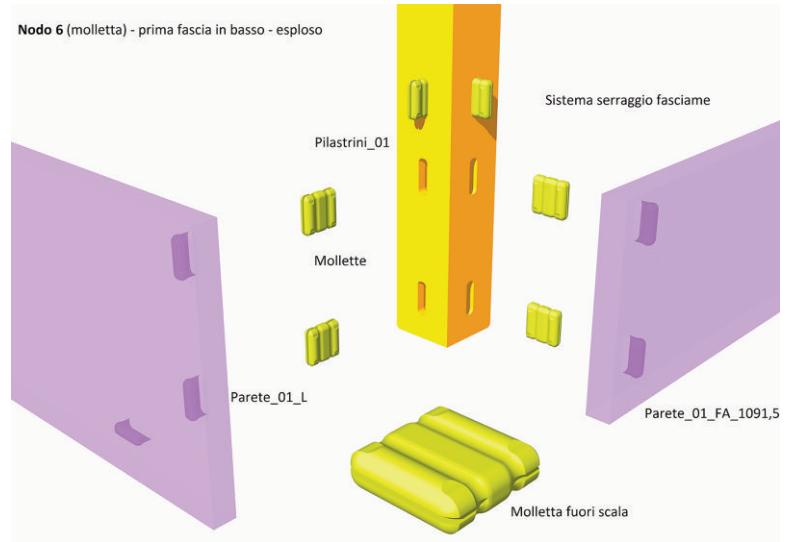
Exploded perspective view of some coupling points by means of the Peg component.
